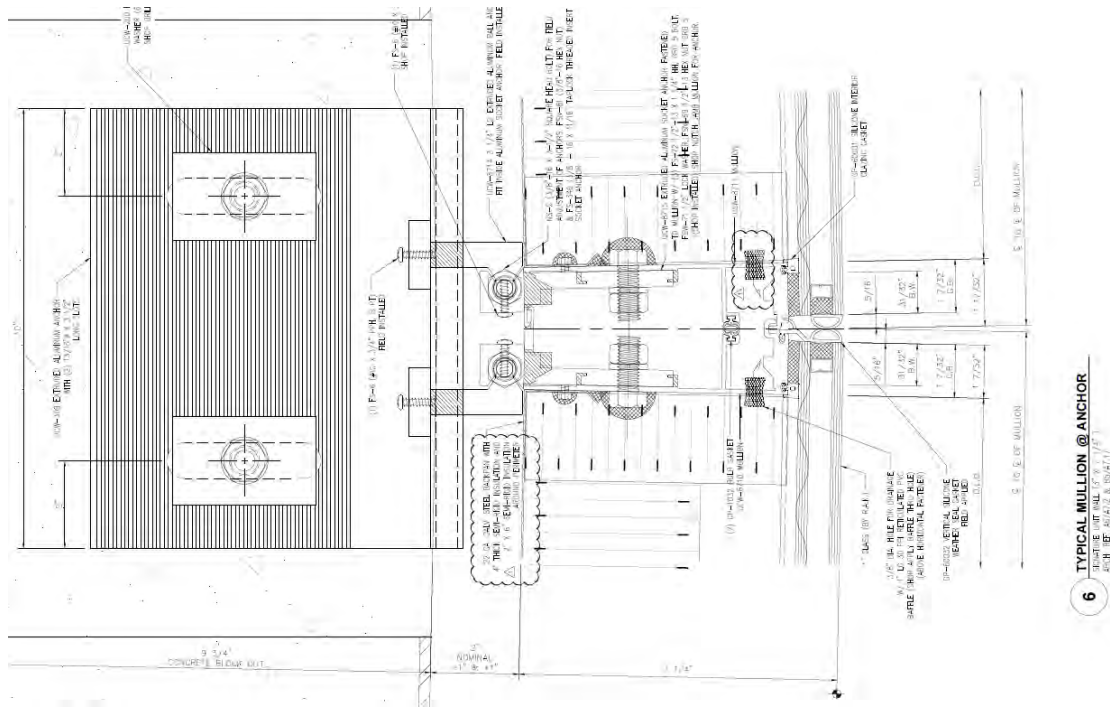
Detail #2. Section of the analyzed split mullion. Drawing 5-106.
